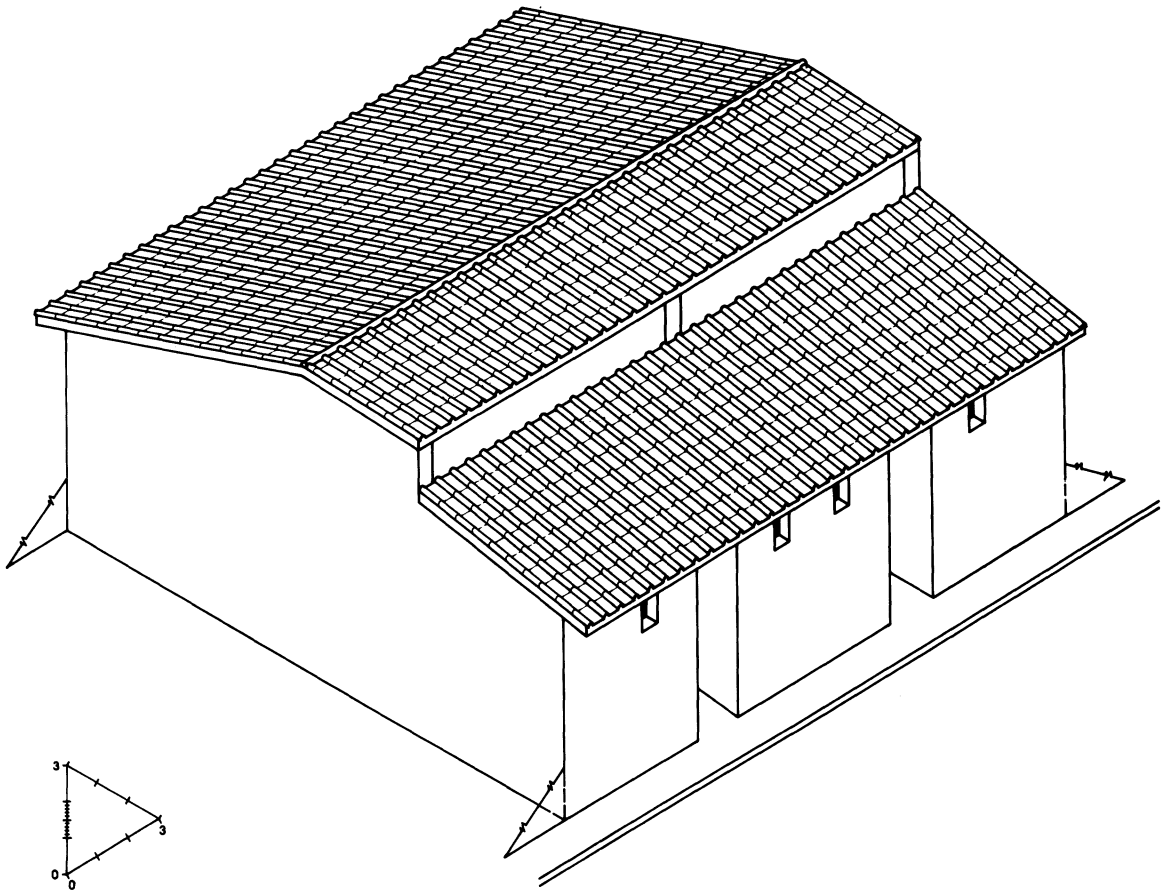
West Block, Periods 1.1-1.3: House Lots 2-3, restored elevation 2
